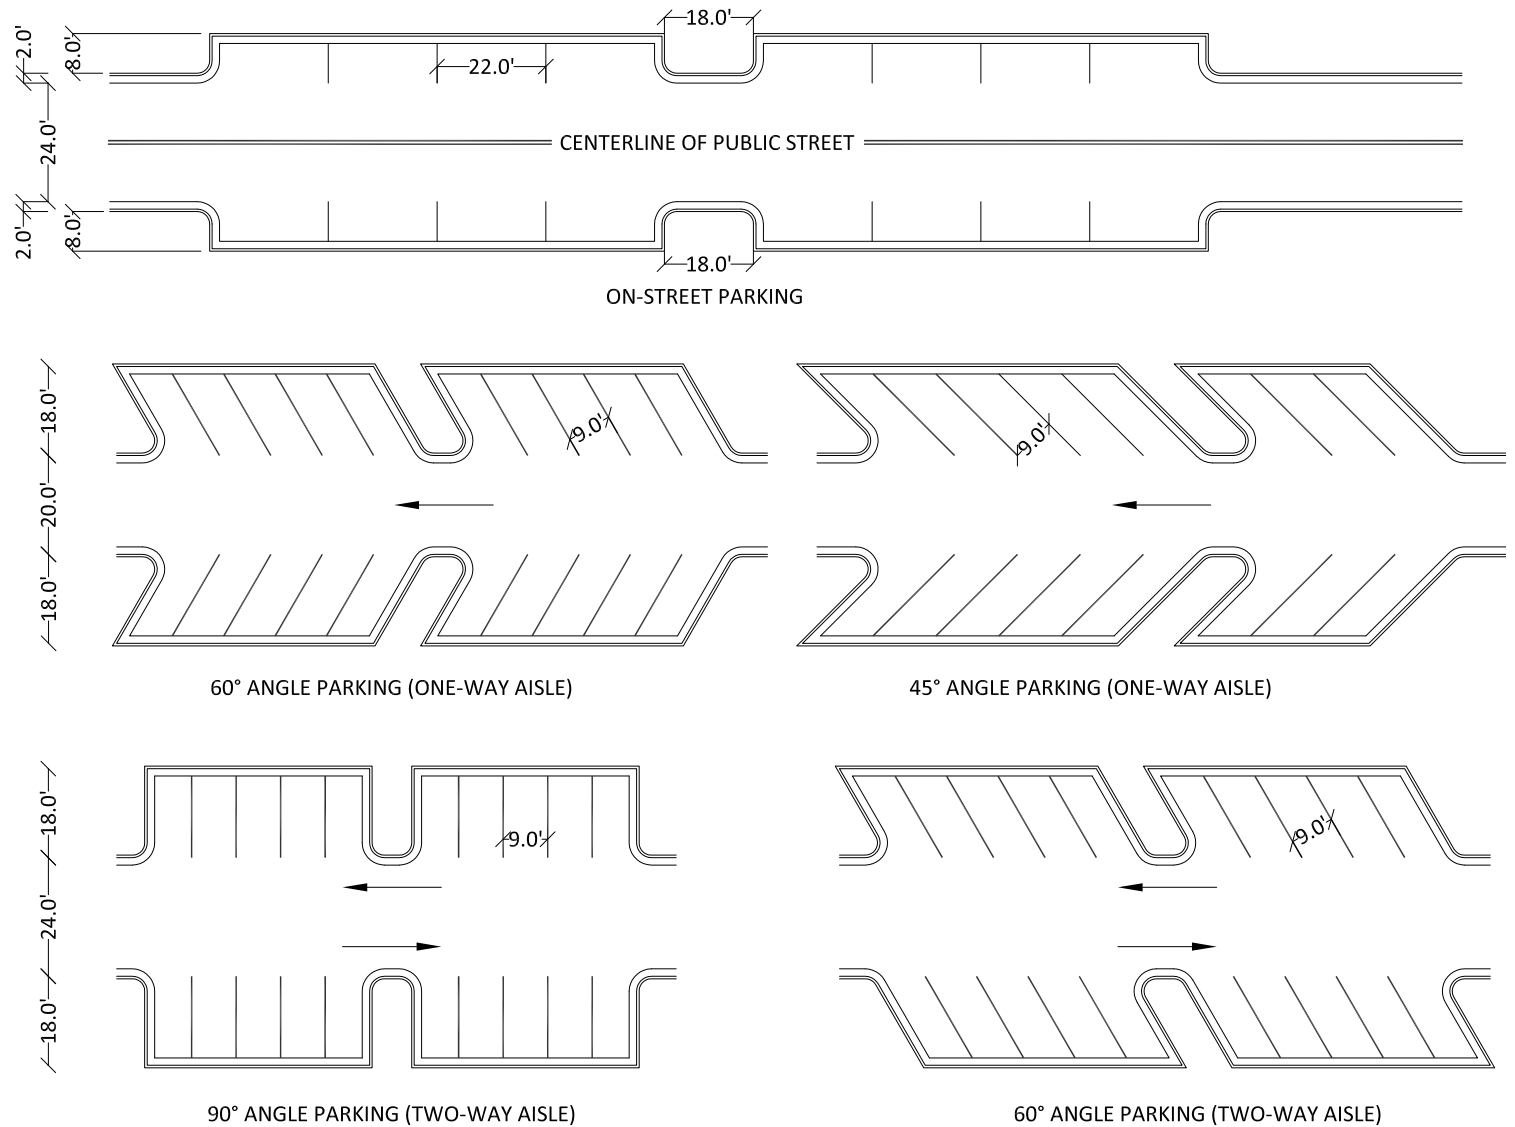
shows recommendations for parking configurations. On-street parking is recommended for the Urban Area and is suitable for other site specific situations. A 90 degree configuration is most common for parking lots.
